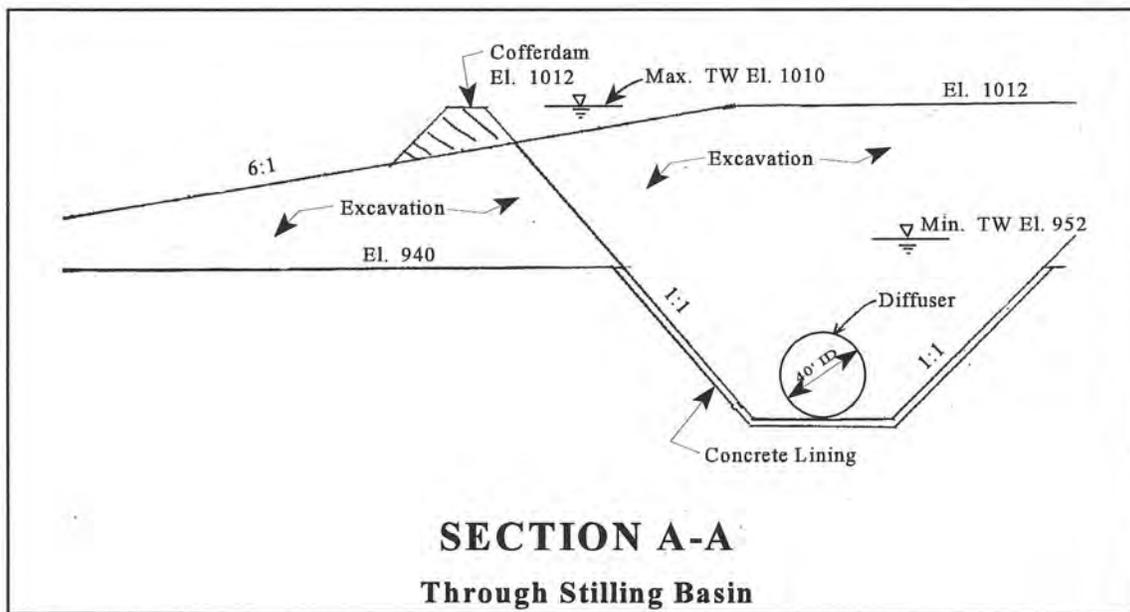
Section through the stilling basin and diffuser for alternative #3, also showing the proposed excavation. (fn:alter#3-3.wpg)
